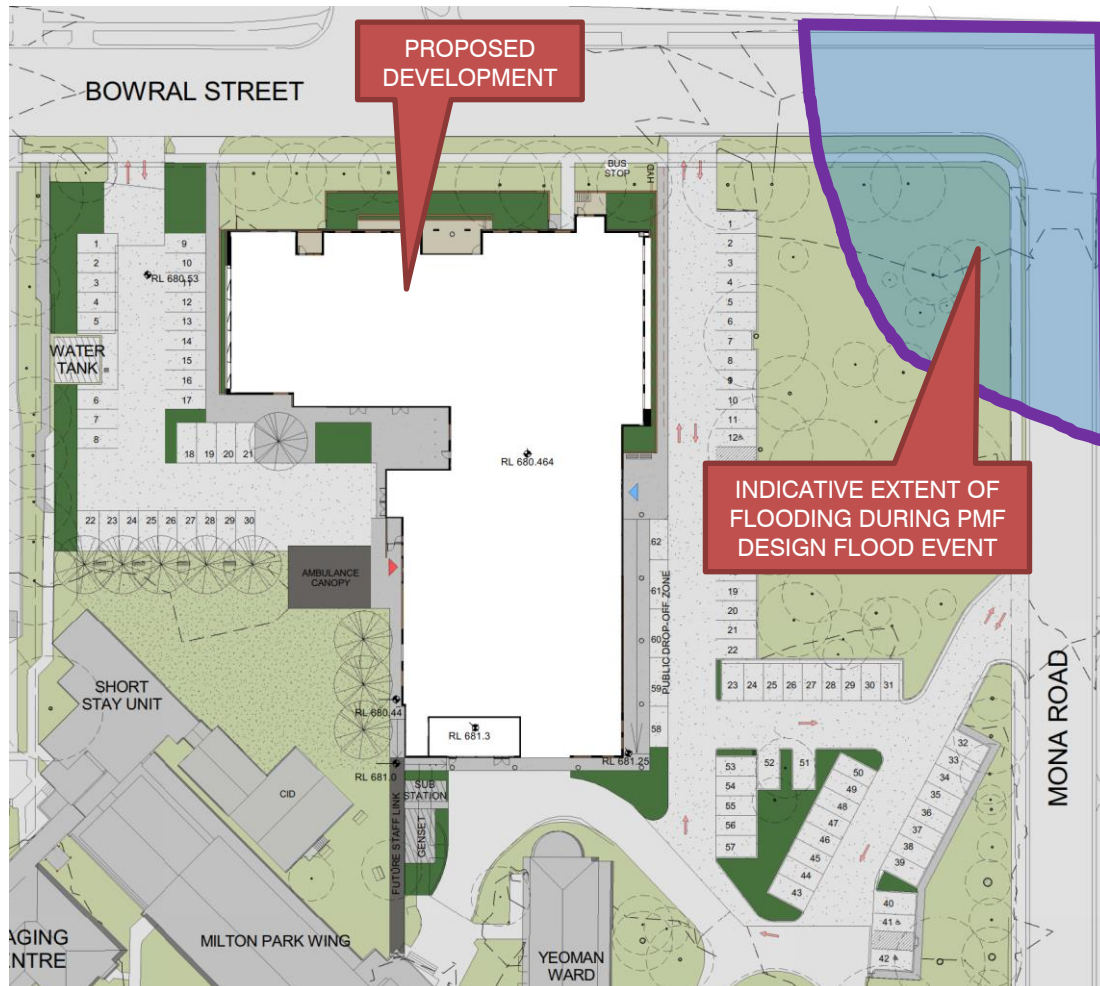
Site Plan Extract with Extent of Flooding During PMF (Source: MSJ Architects)
